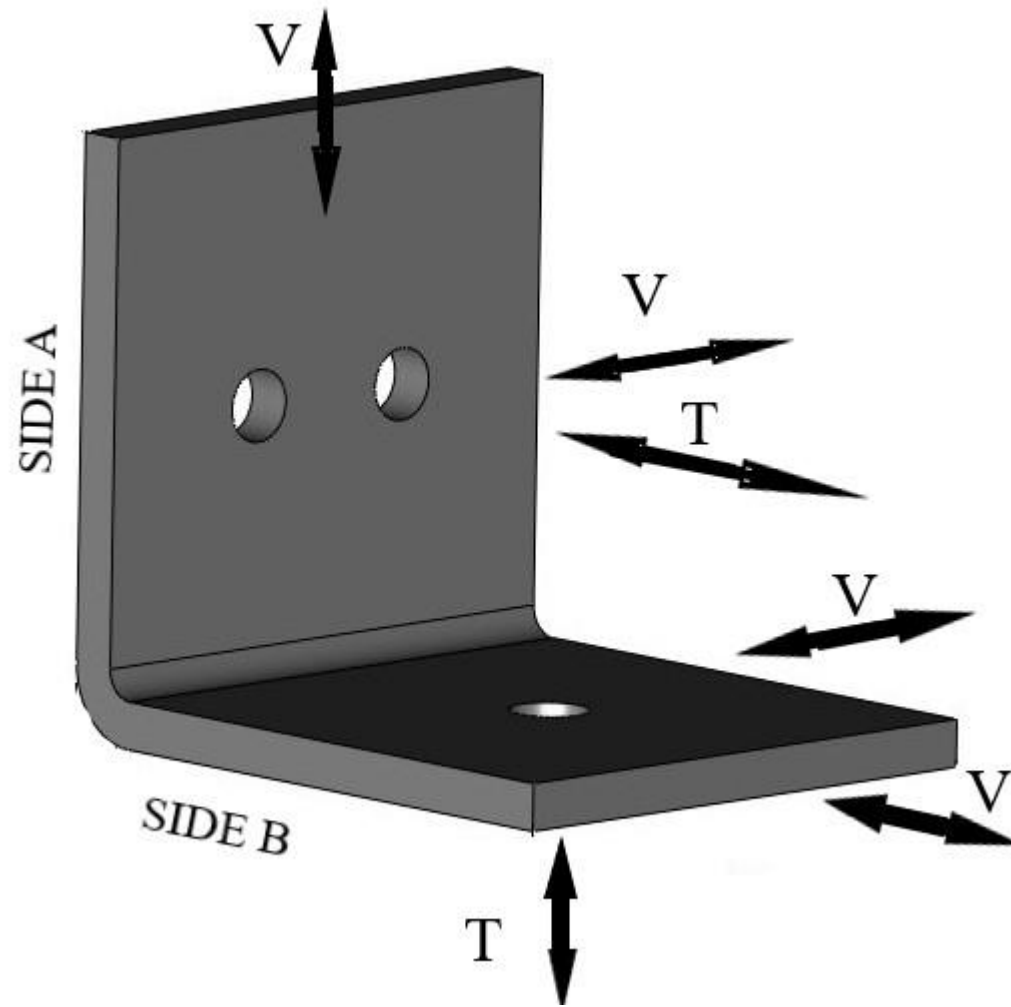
STEEL BRACKET LOAD ORIENTATION
